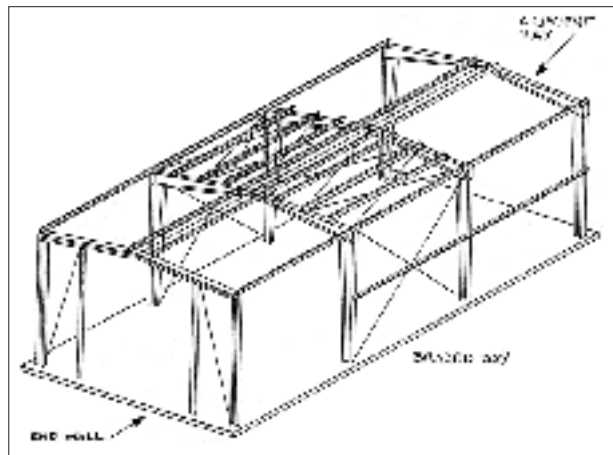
With no sheathing to provide racking resistance, a braced bay is needed to prevent wind loads from collapsing the building.
